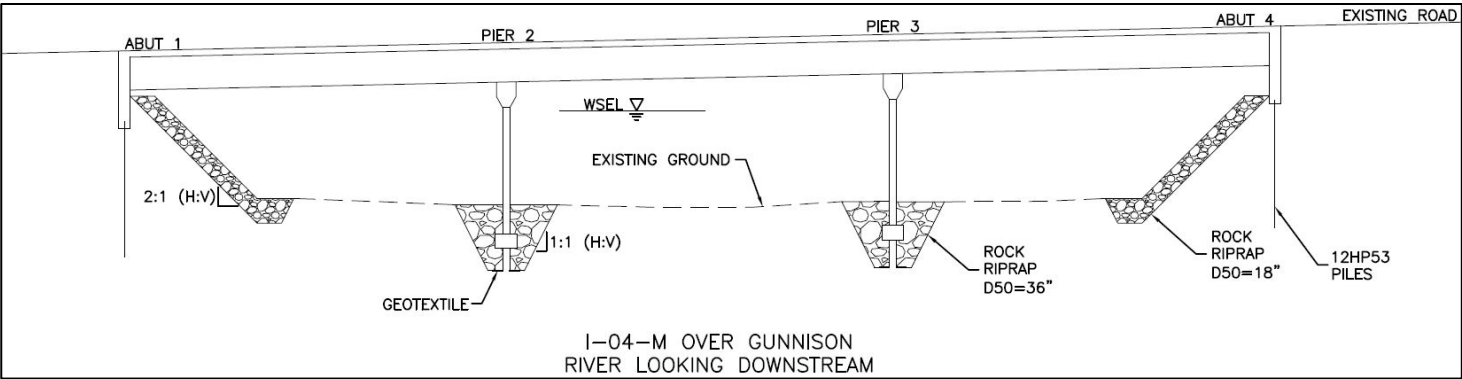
Cross-sectional view of Bridge I-04-M with recommended hydraulic scour countermeasures
